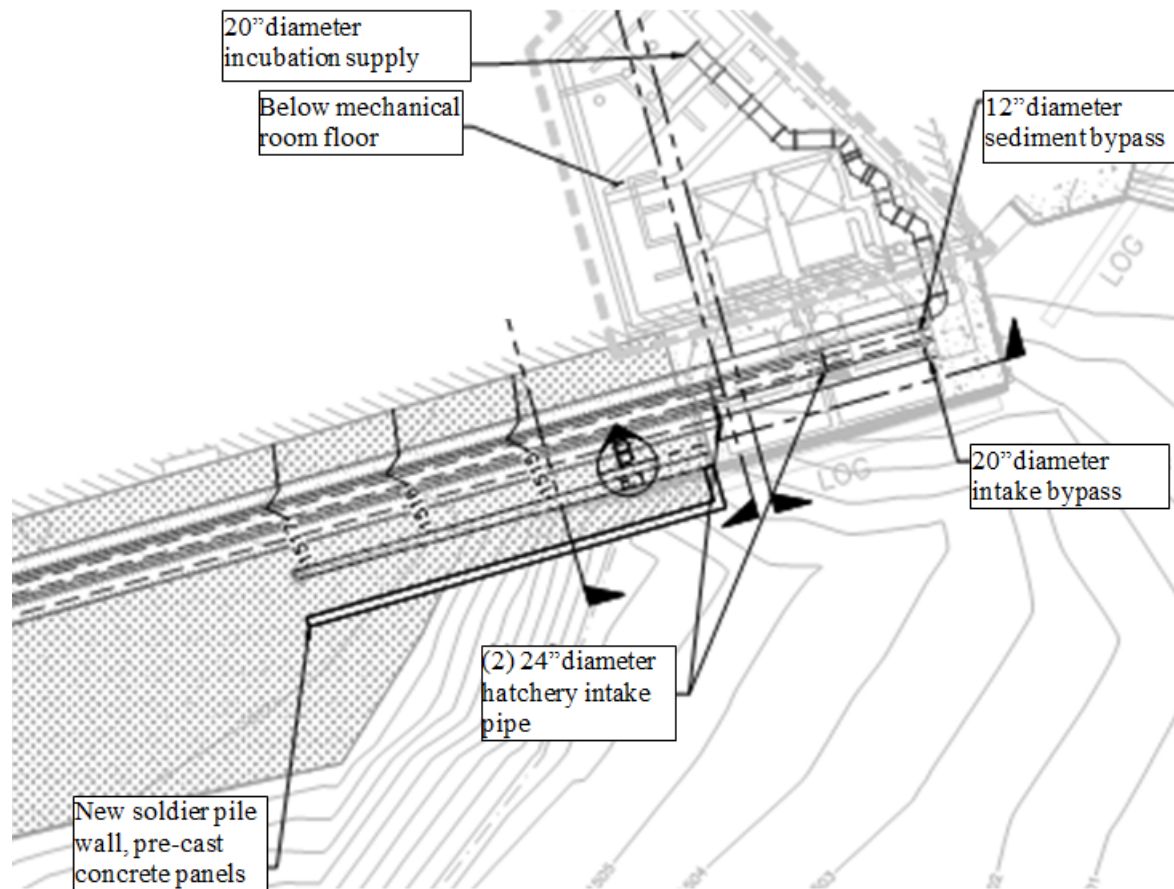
Concept 3 intake site plan at existing intake (Bennett, C. and Kingsley, S., 2013).
